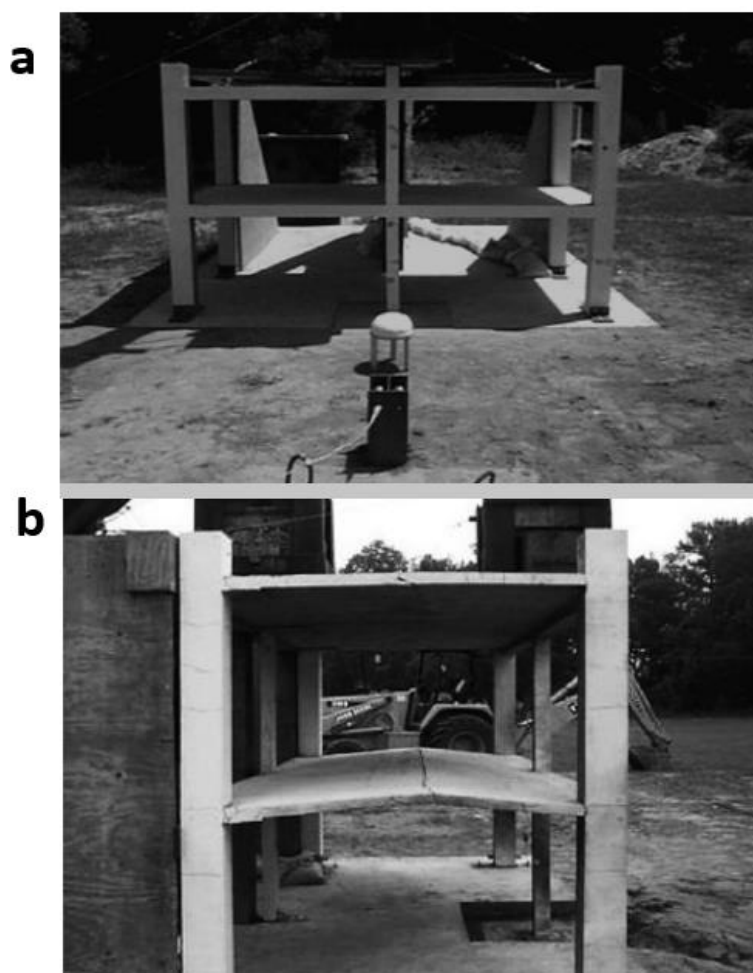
Structure for $1/4$ -scale experiments: (a) no walls and (b) Damage to the intermediate floor (Baylot and Bevins 2007).
